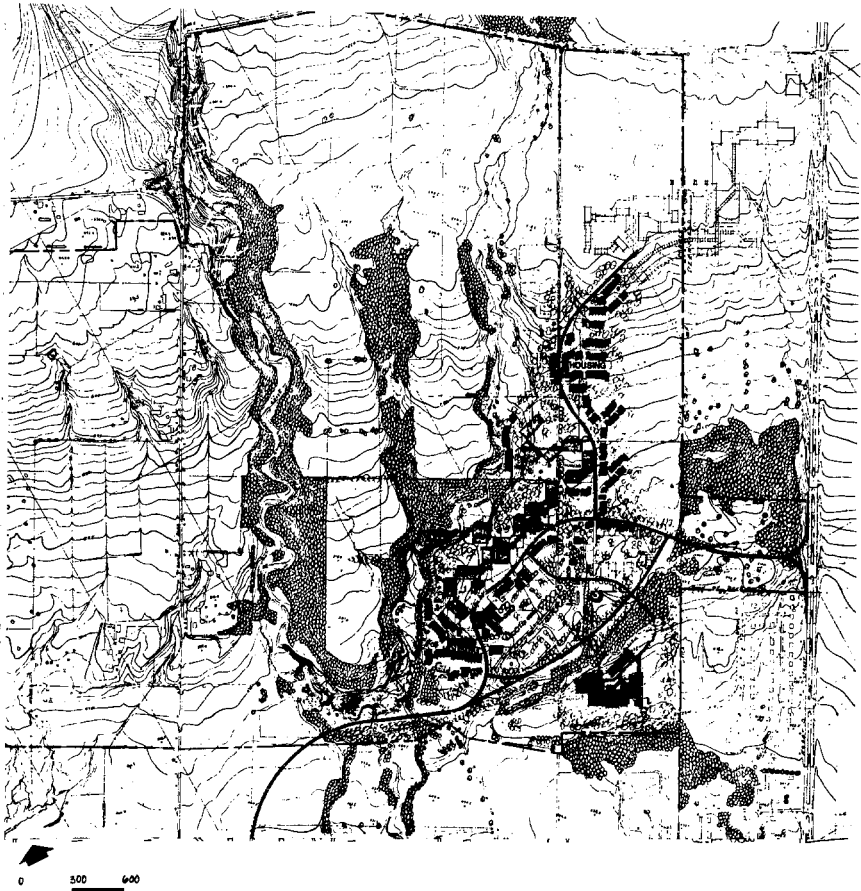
Comprehensive campus building and site plan for the initial phase of construction (to 1980).
